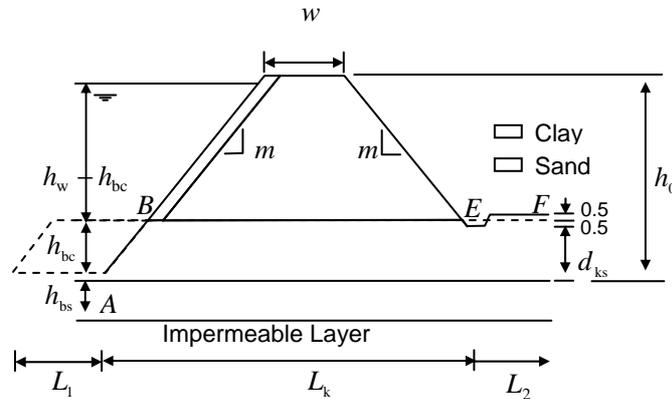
Typical dike cross section with inclined facing on two-phase fluvial facies basement
